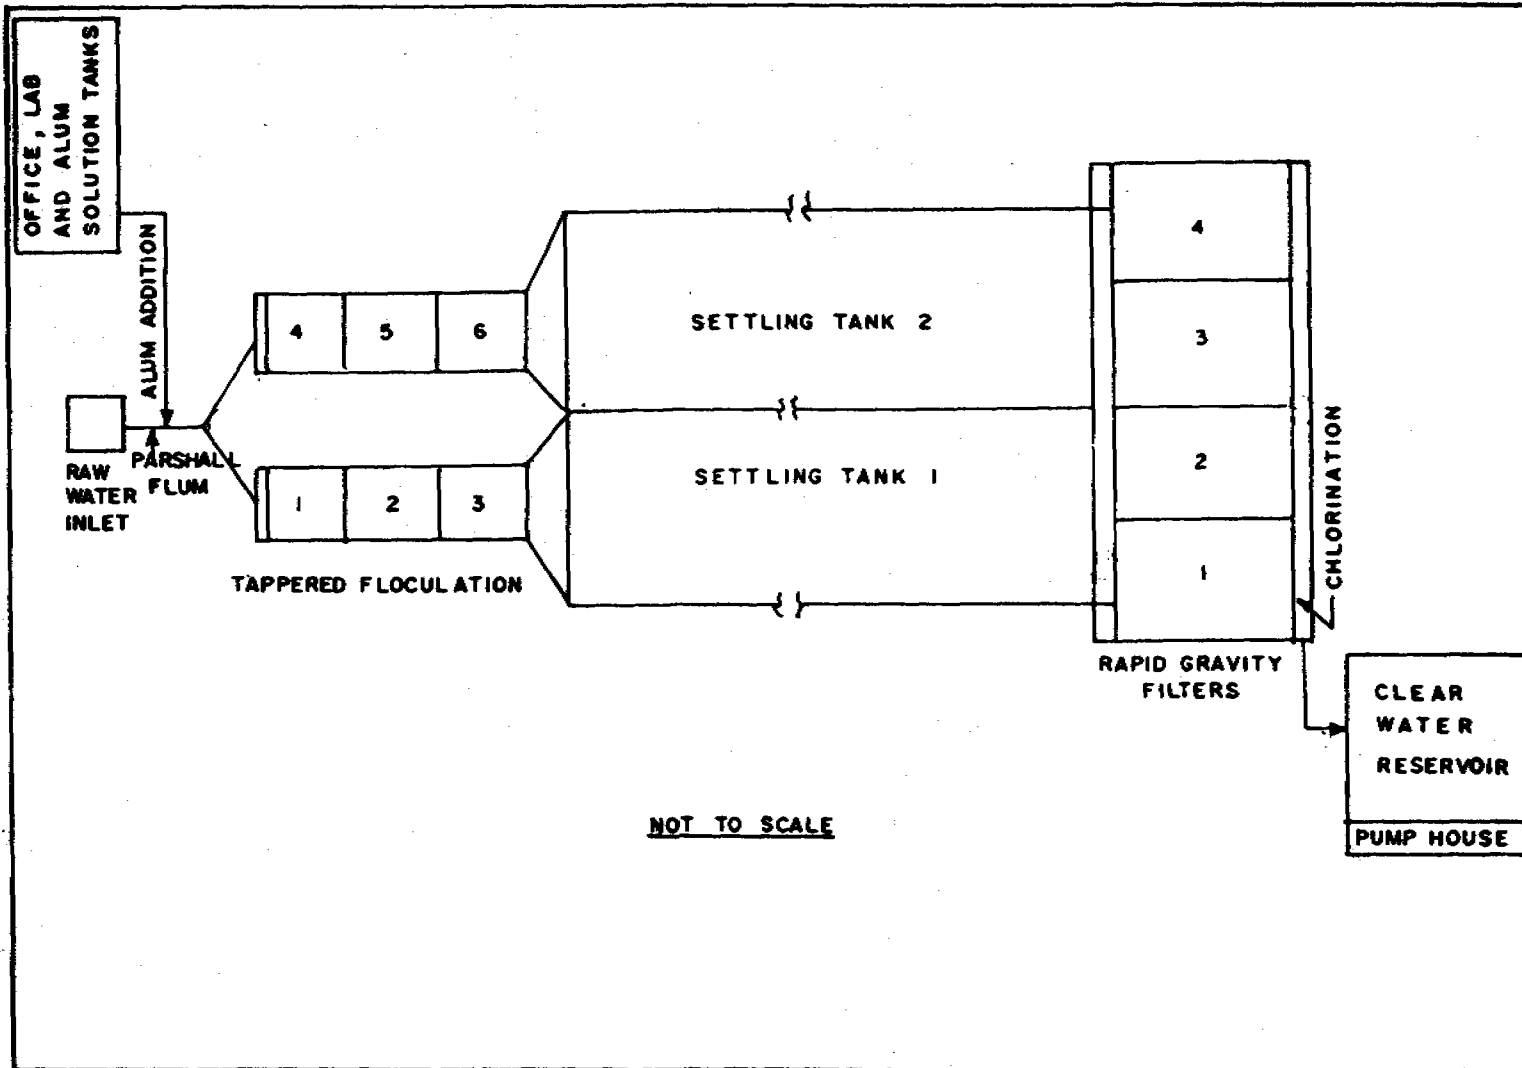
LAYOUT PLAN OF WATER TREATMENT PLANT, CHANDIGARH
